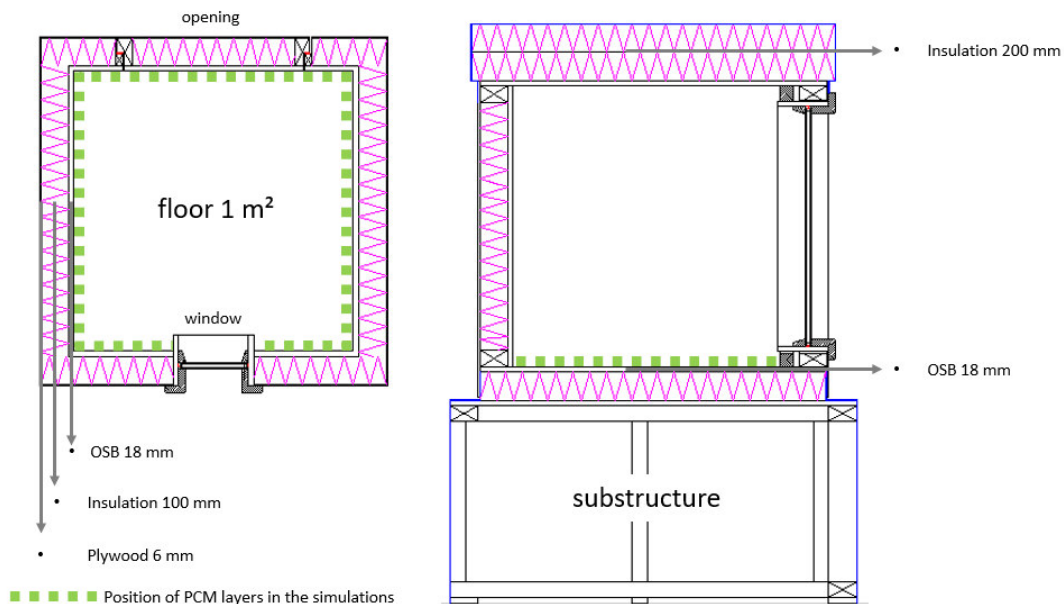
Plan view (left) and side elevation (right) of the test cube which was placed in Austria used to validate numerical simulations
